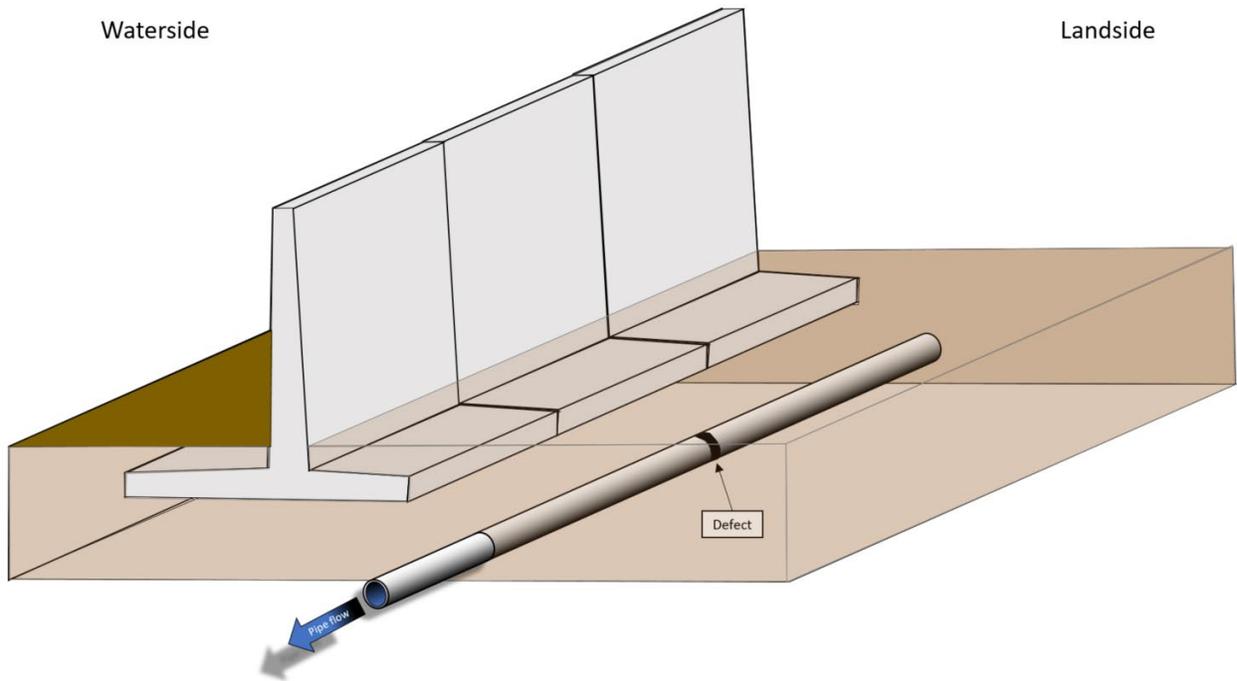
A pipe defect in the floodwall toe drain develops during installation or over time.
